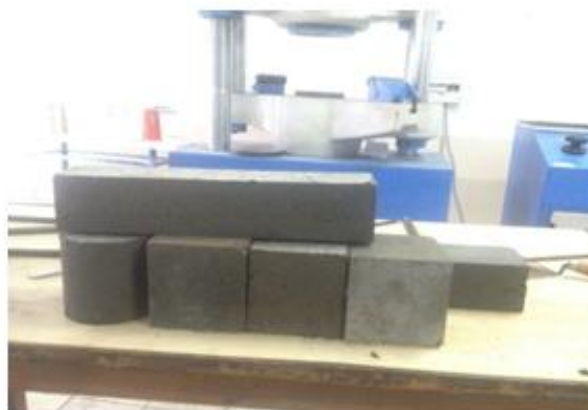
Beams, Cubes and a cylinder made up of conventional concrete.
